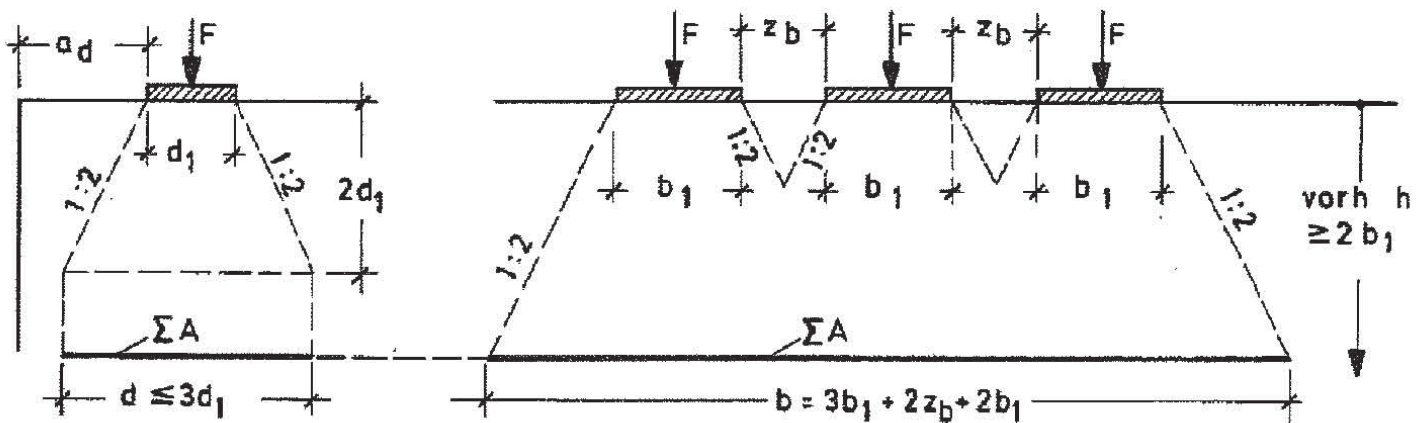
Determining the calculated distribution surface A_{c1} ($=A$) according to Leonhardt (Lecture on concrete and masonry construction – Part 2: Special cases for calculation of reinforced concrete constructions).
